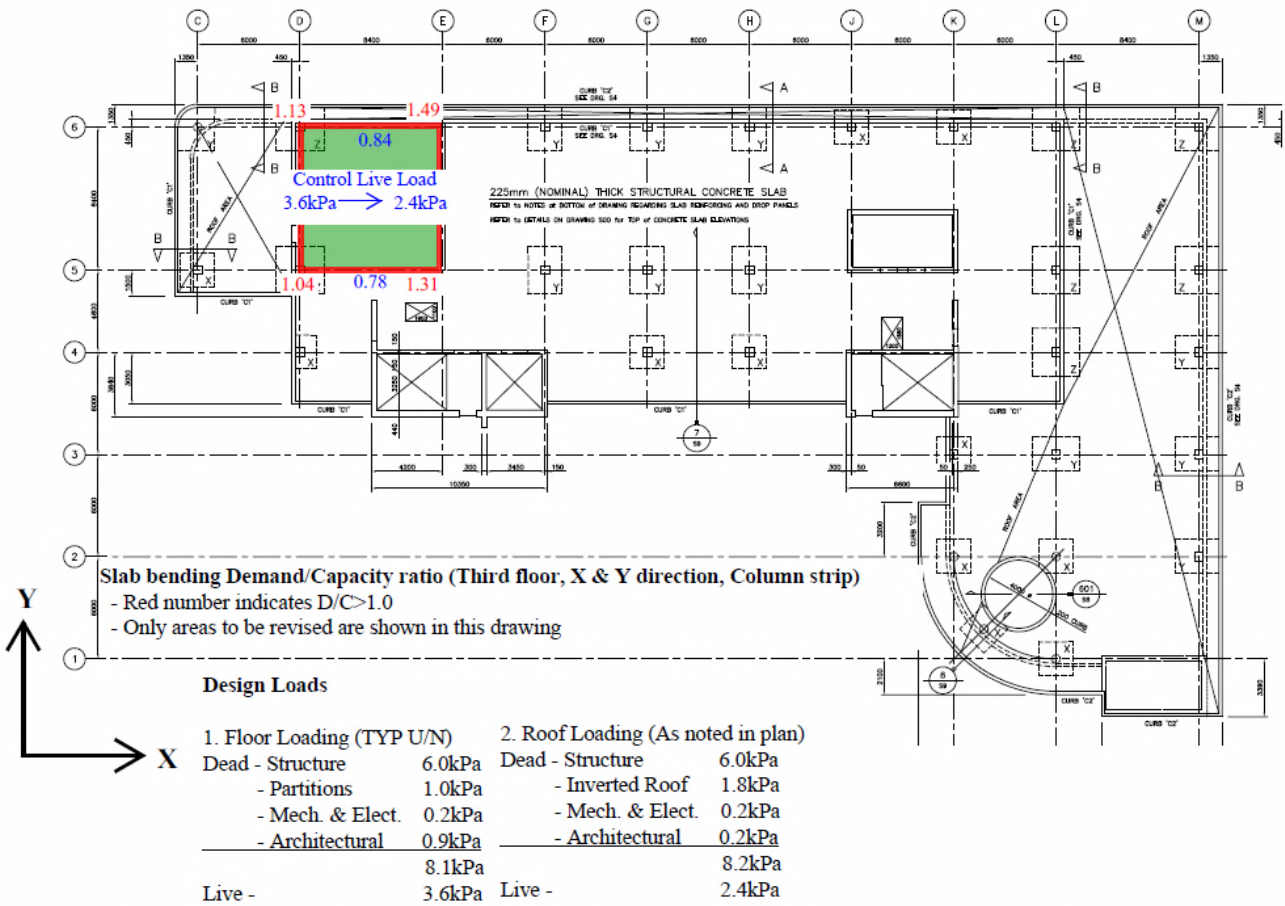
Slab bending D/C ratios (Third floor, X and Y directions, Column strip)
